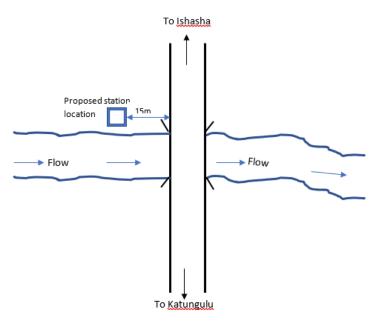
Layout of proposed project site for surface water monitoring station in Nchwera
